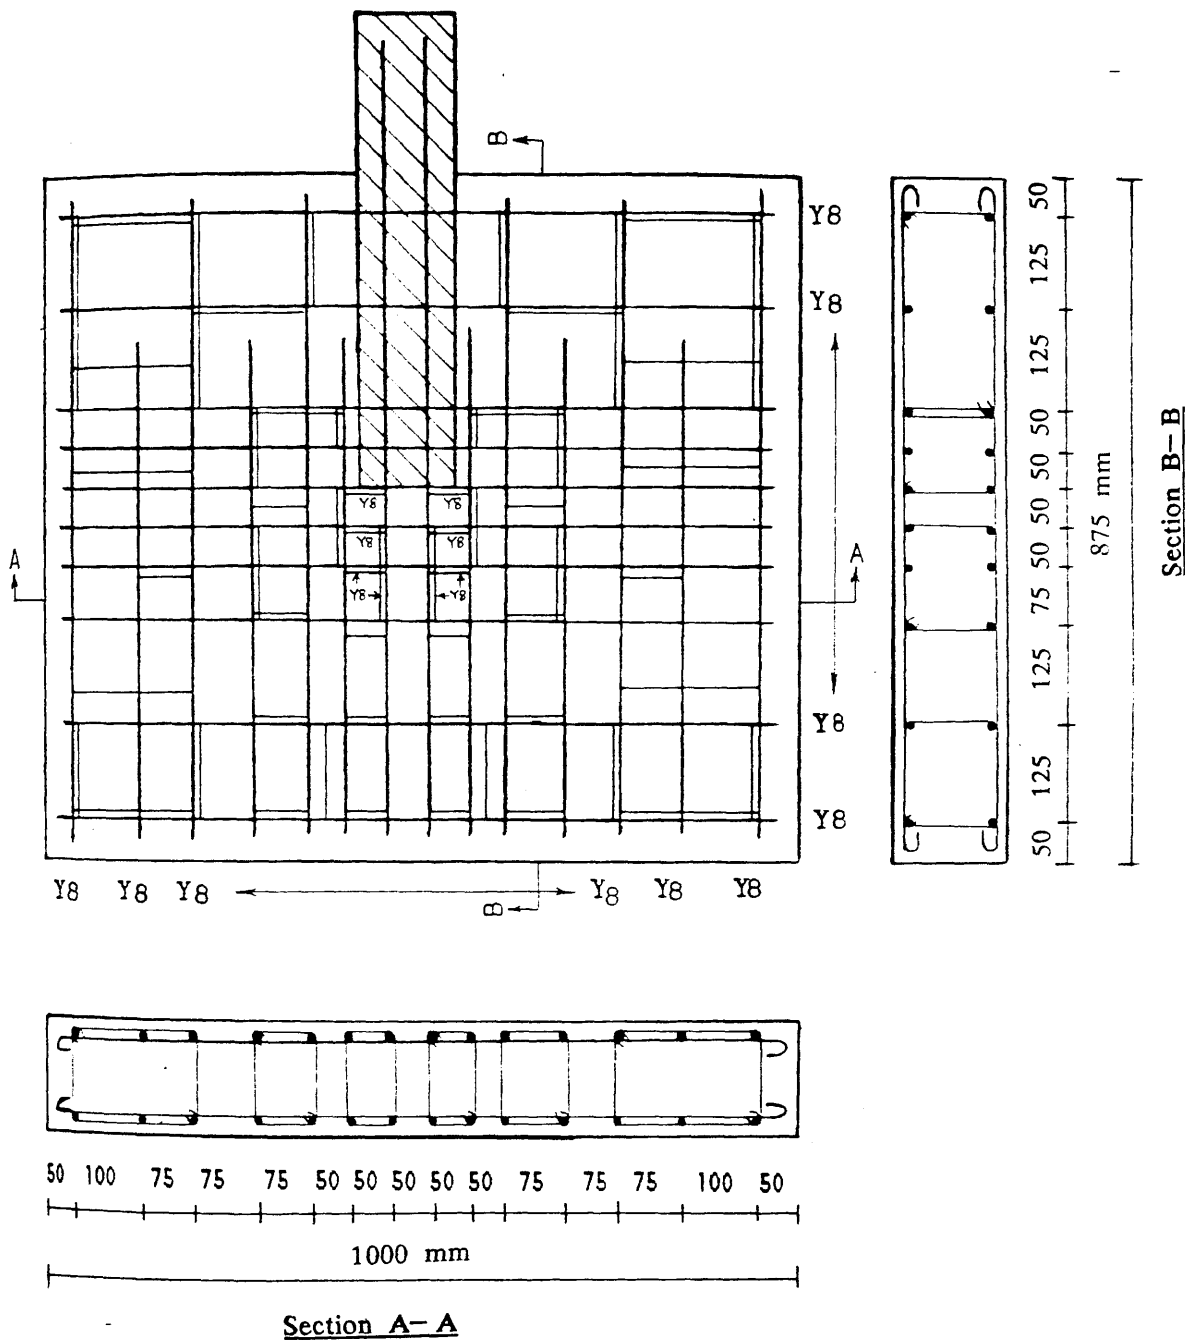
A horizontal section in the wall of model MS4 showing the reinforcing details
